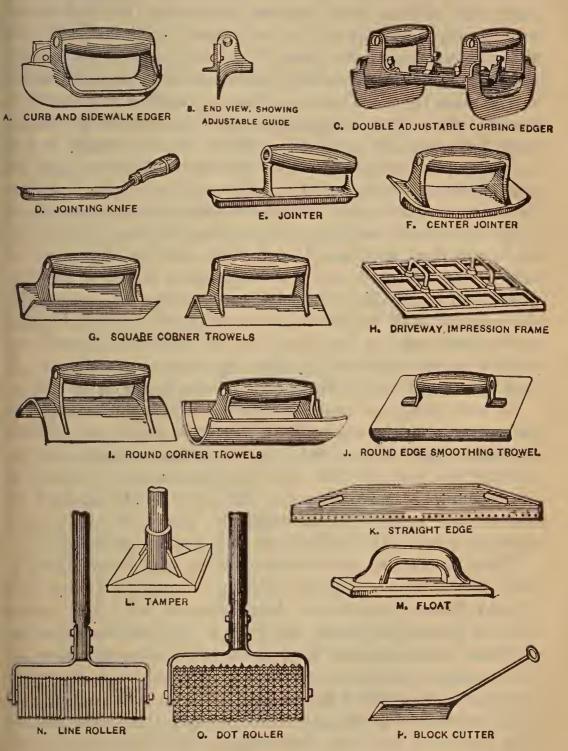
Tools Used in Laying Sidewalks, etc.
